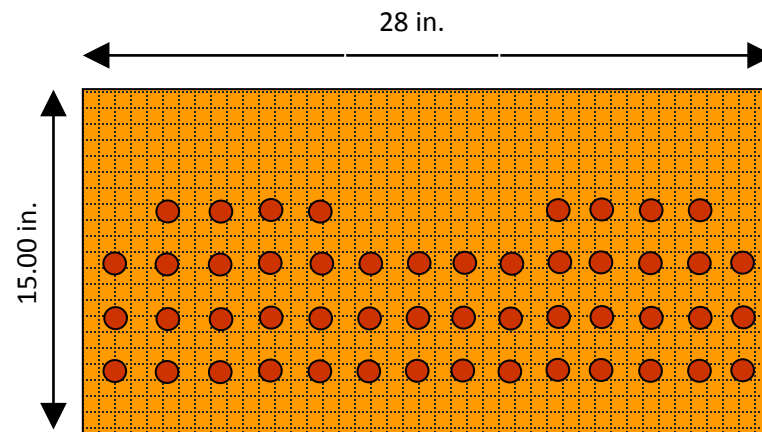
Finite Element Mesh of Girder Specimens D1 and D2
